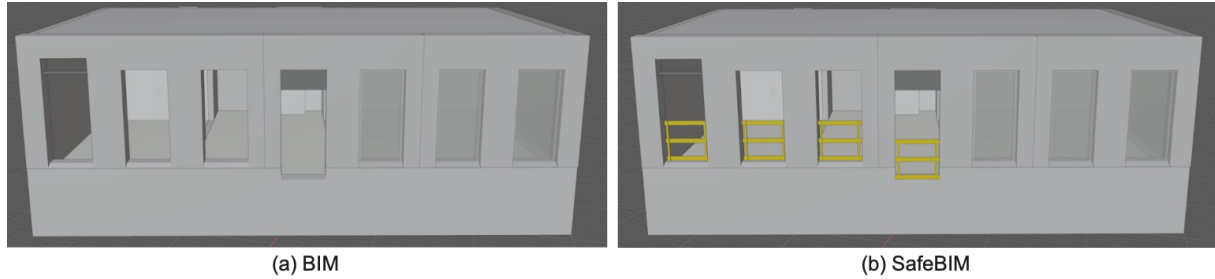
SafeBIM with the construction site. In total, 6 windows and 1 door; out of which 3 windows have already been installed.
